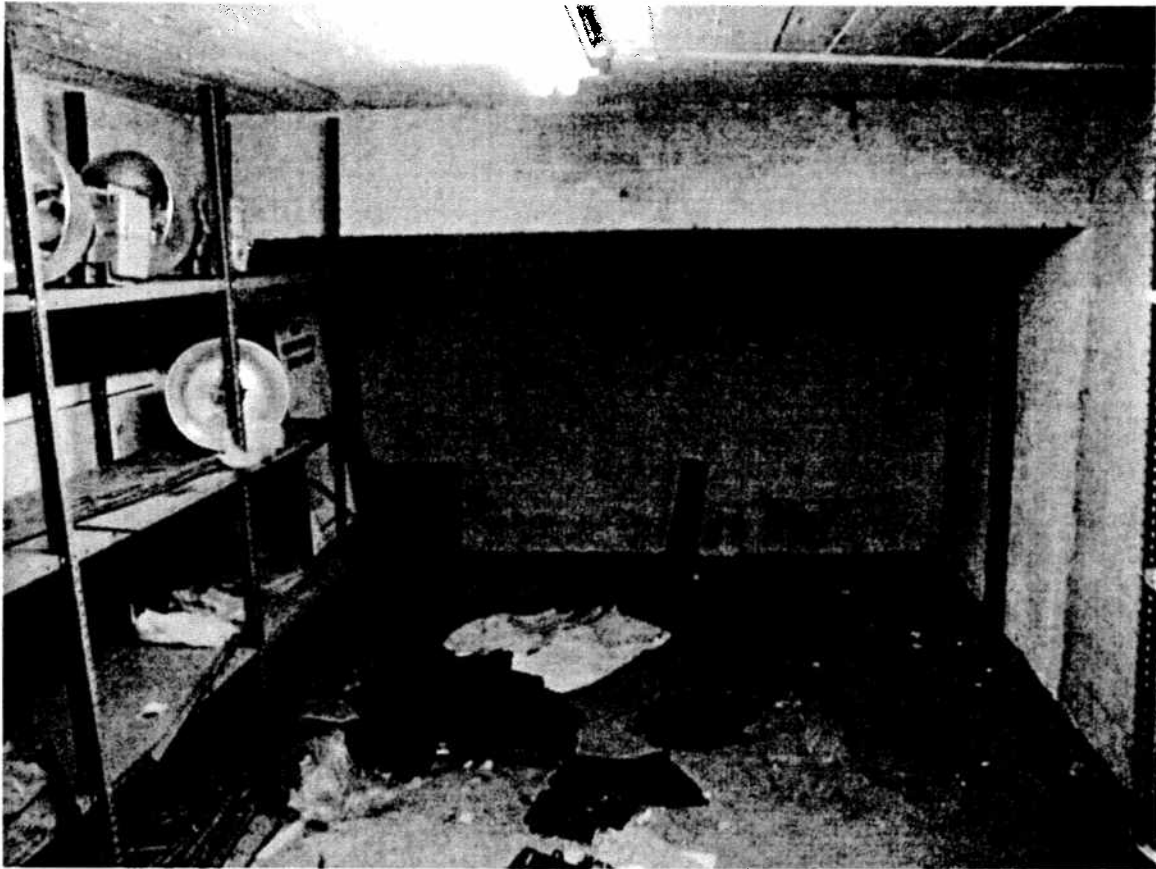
Healdton Armory – indoor firing range, small room located off the northwest corner of the indoor firing range showing recently replaced lighting held in storage.
